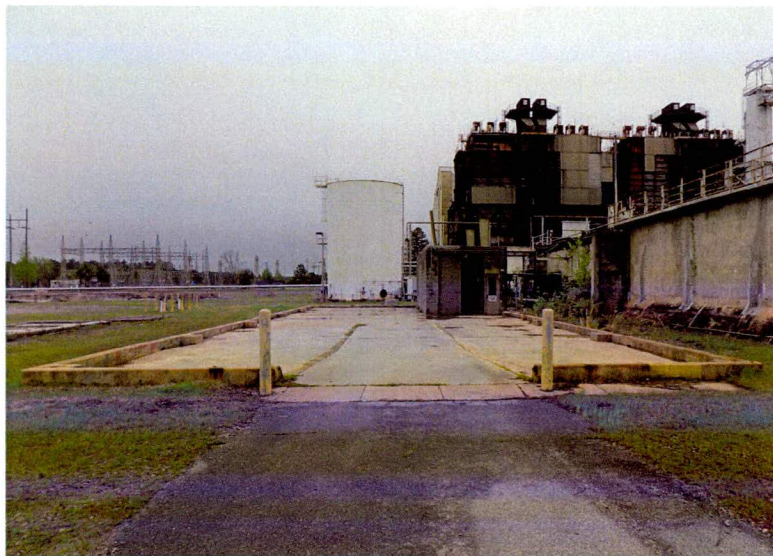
Building 683-D (Looking East) After Partial Decommissioning by CRO
